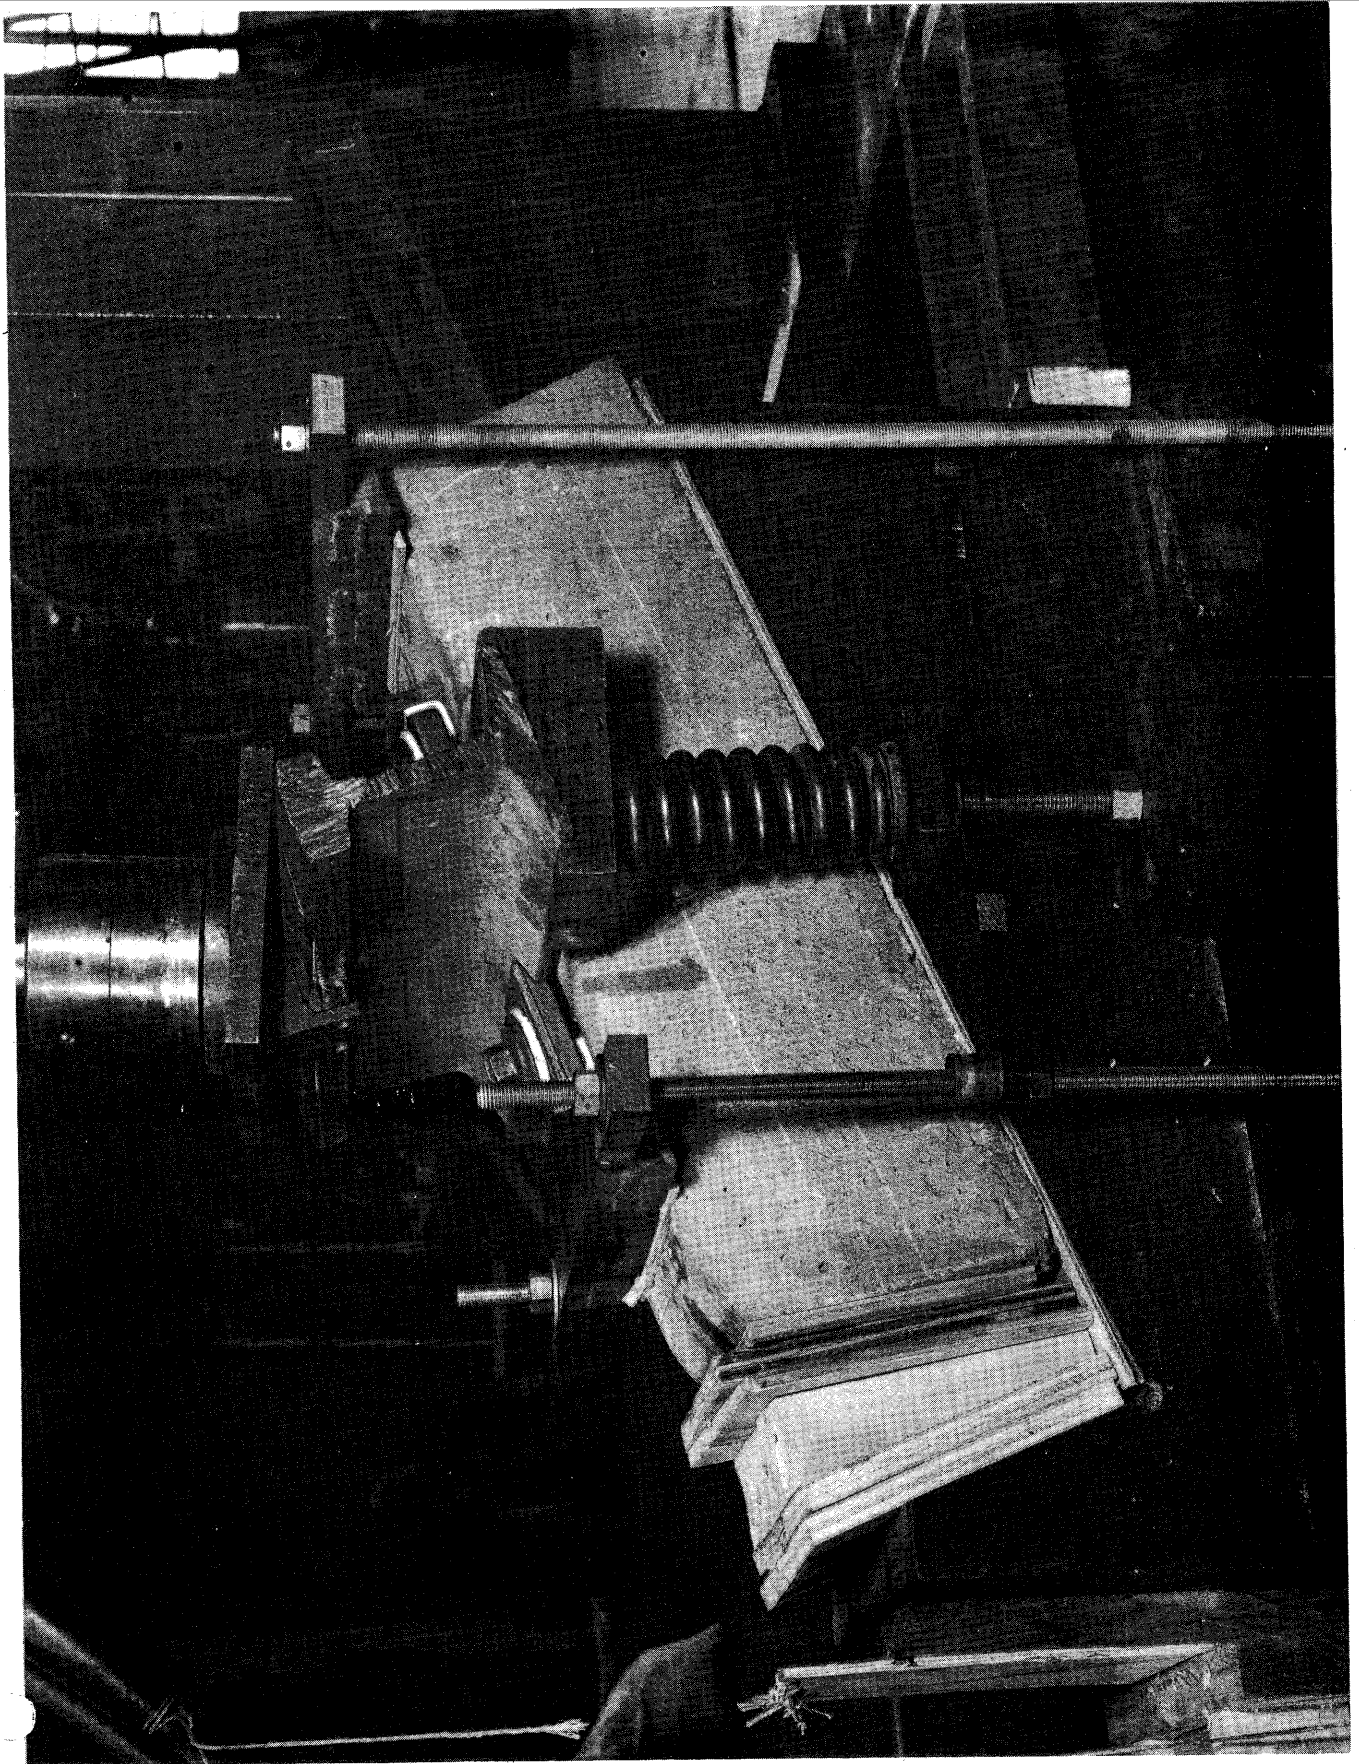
Fastening Seat Repeated Load Test Setup.
